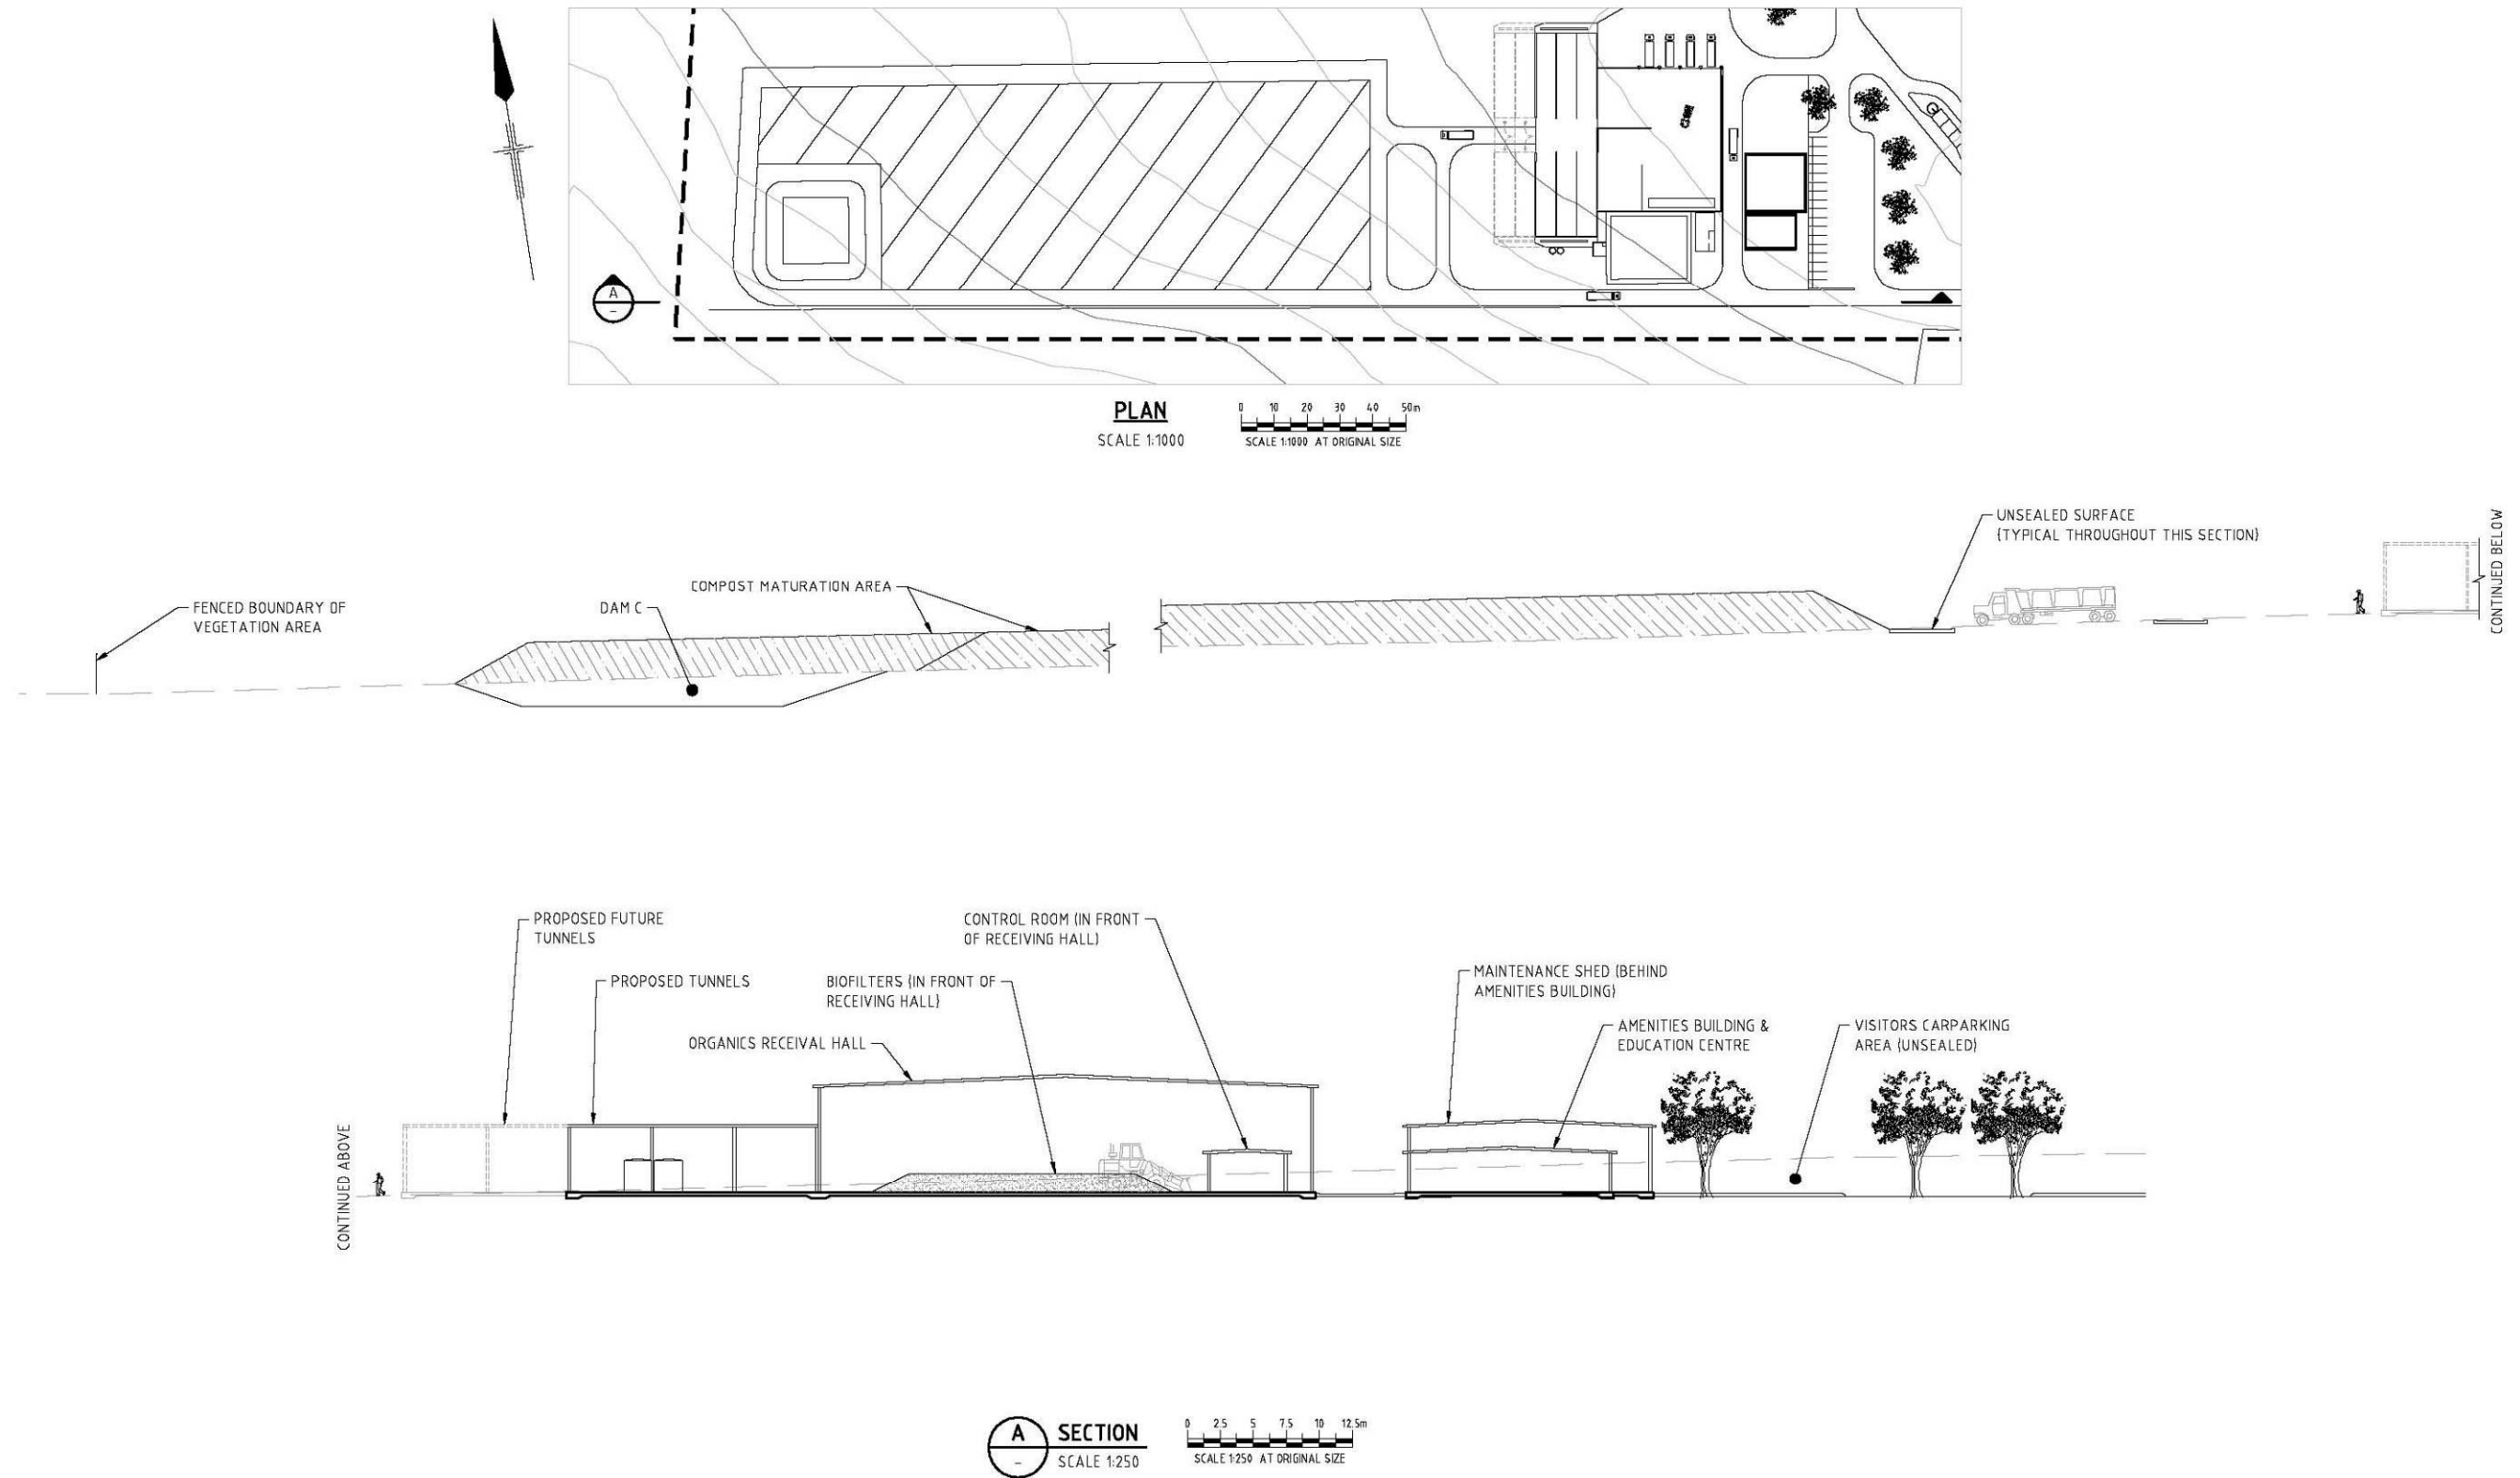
Conceptual enclosed tunnel composting plant (elevations)
